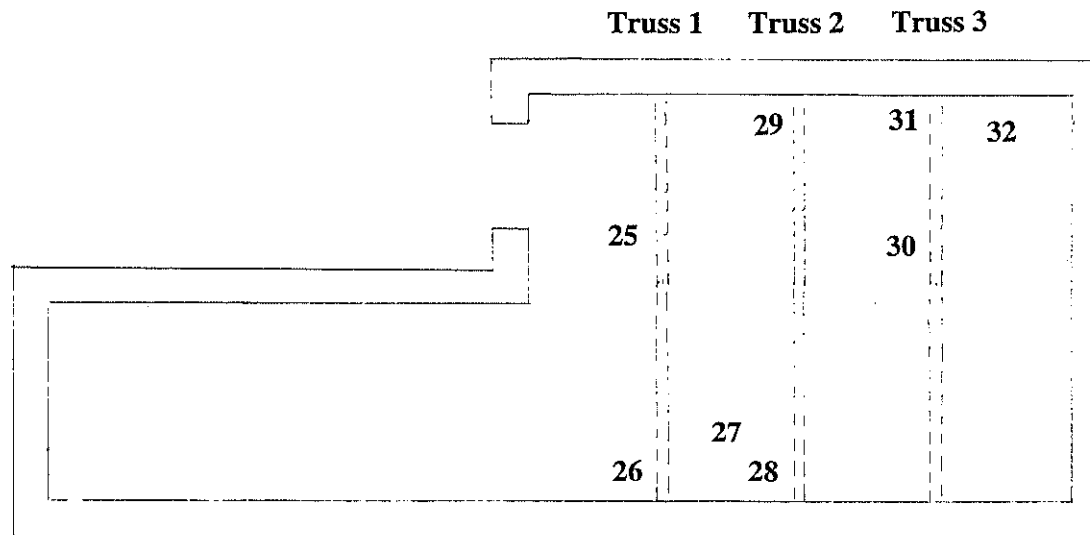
Plan of the trusses in the detached barn to show sample locations and central roof truss
